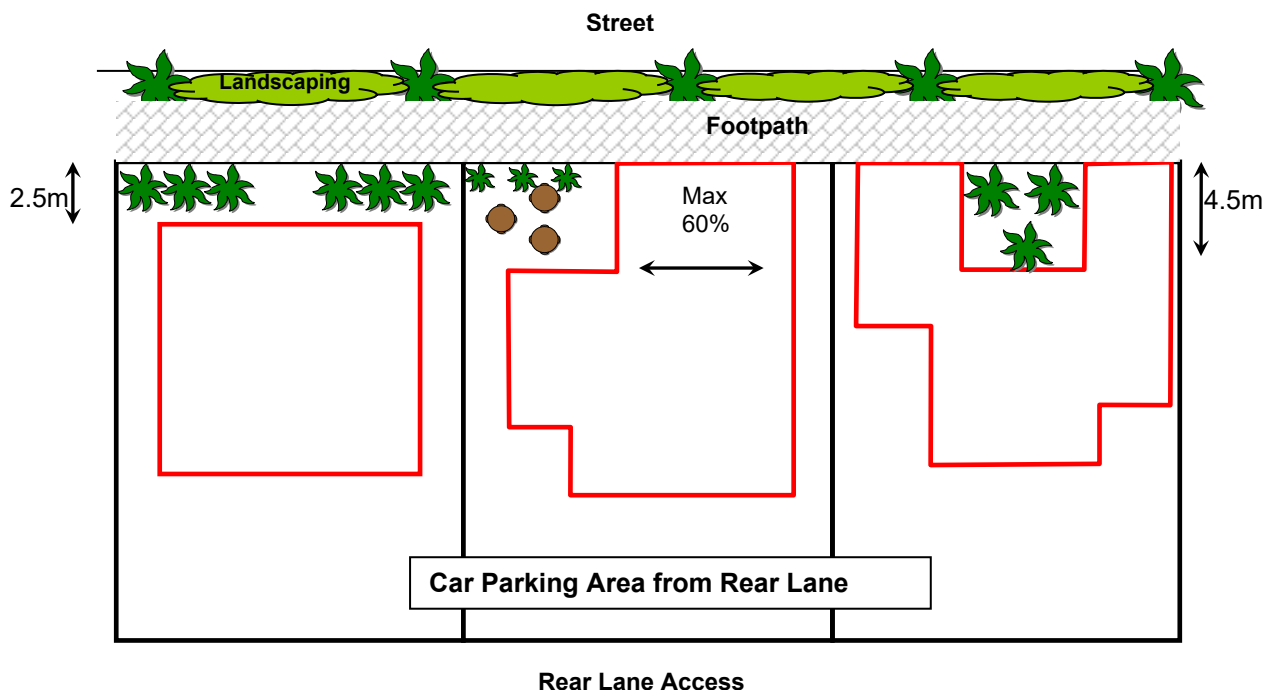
South Jonson Street – Setbacks to Street Frontage
